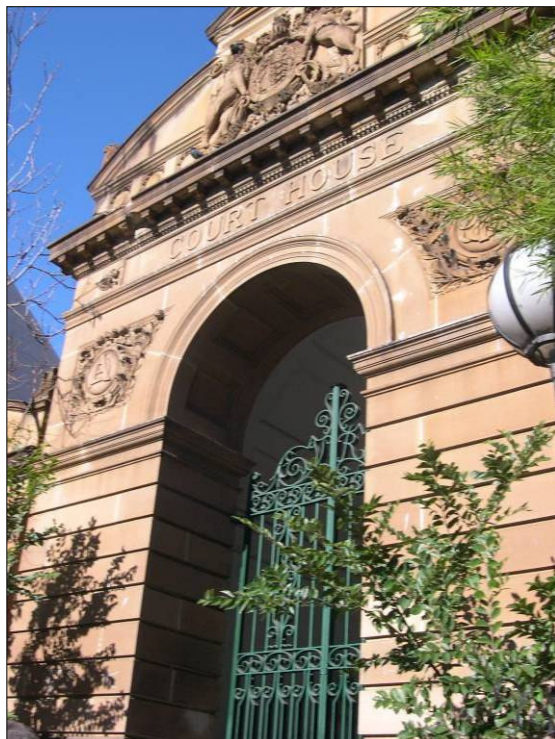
Main arched entrance and the central portico of the Court House (left); the fretting and deterioration of the stone fabric is clearly evident on the main façade (above).
